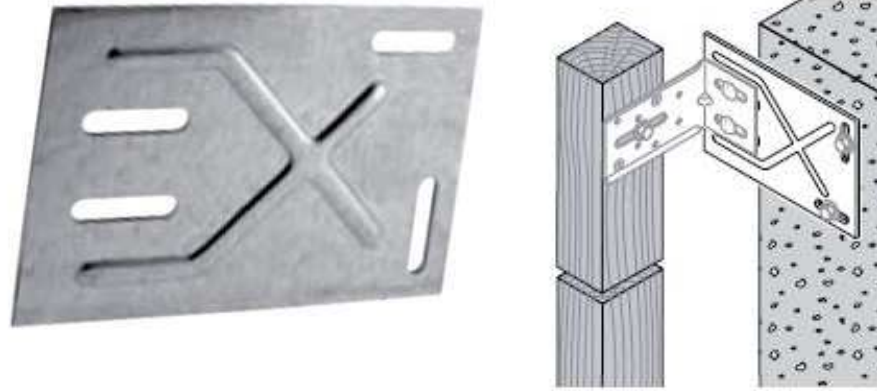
Auxiliary angle plate, galvanised steel Z350. Thickness: 2.5 mm
